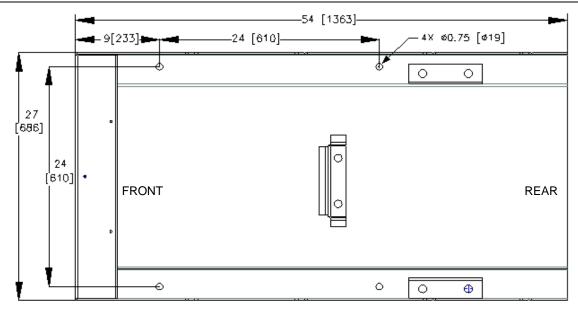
BMK2500-3000 Anchor Bolt Locations
